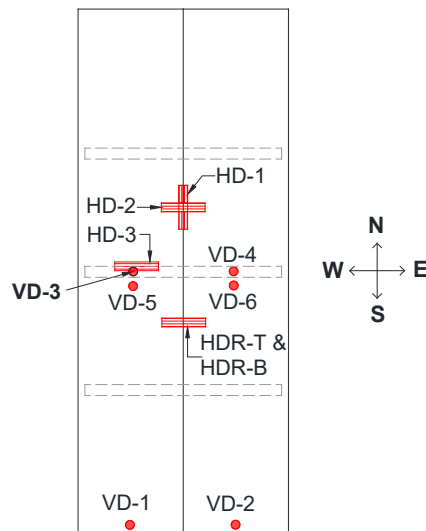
LVDT Installation Plan for the Glulam Timber Slab Bridge Specimen
